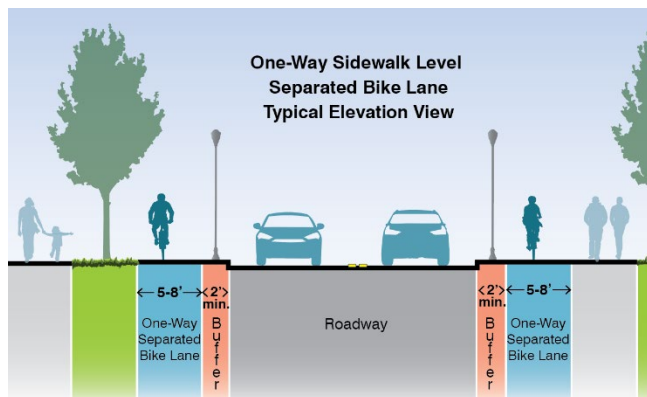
Paired One-Way Separated Bike Lanes at Sidewalk Level
